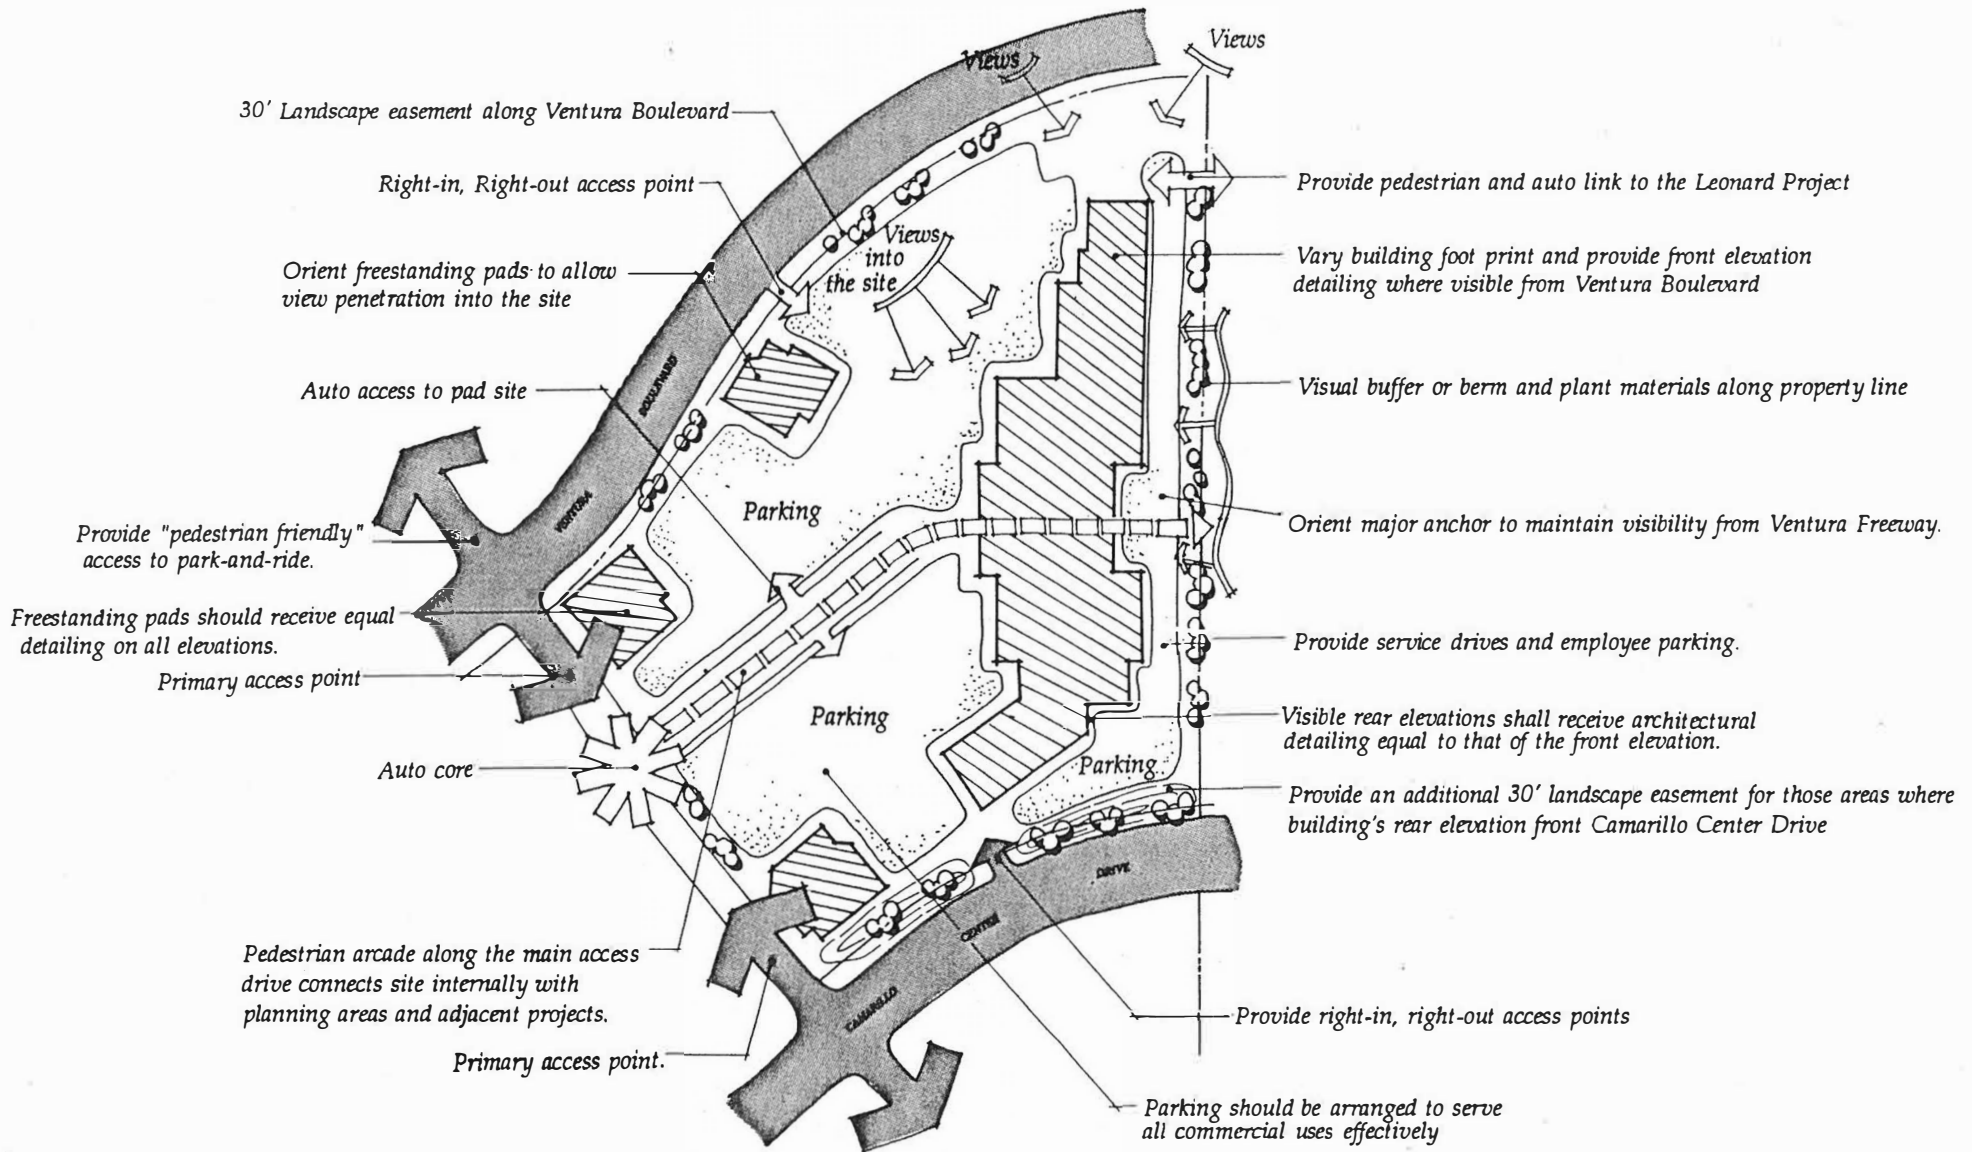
Planning Area 1 • Site Planning Concept Commercial
